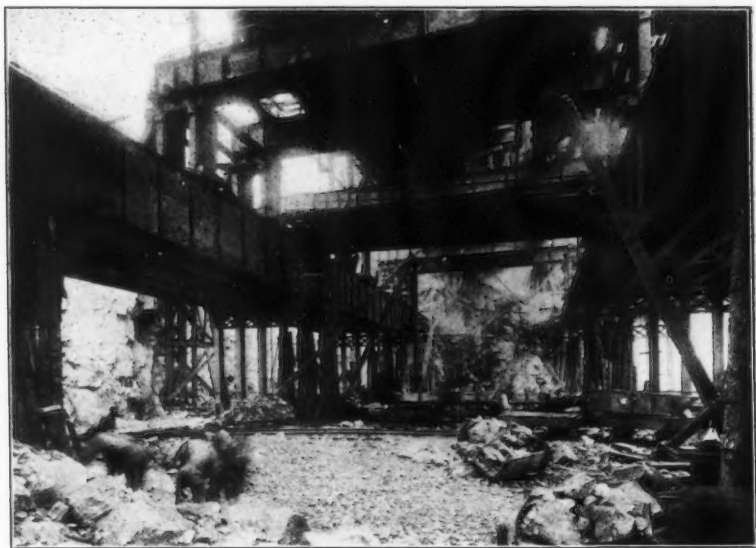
NINTH AVENUE BRIDGE DURING CONSTRUCTION.
